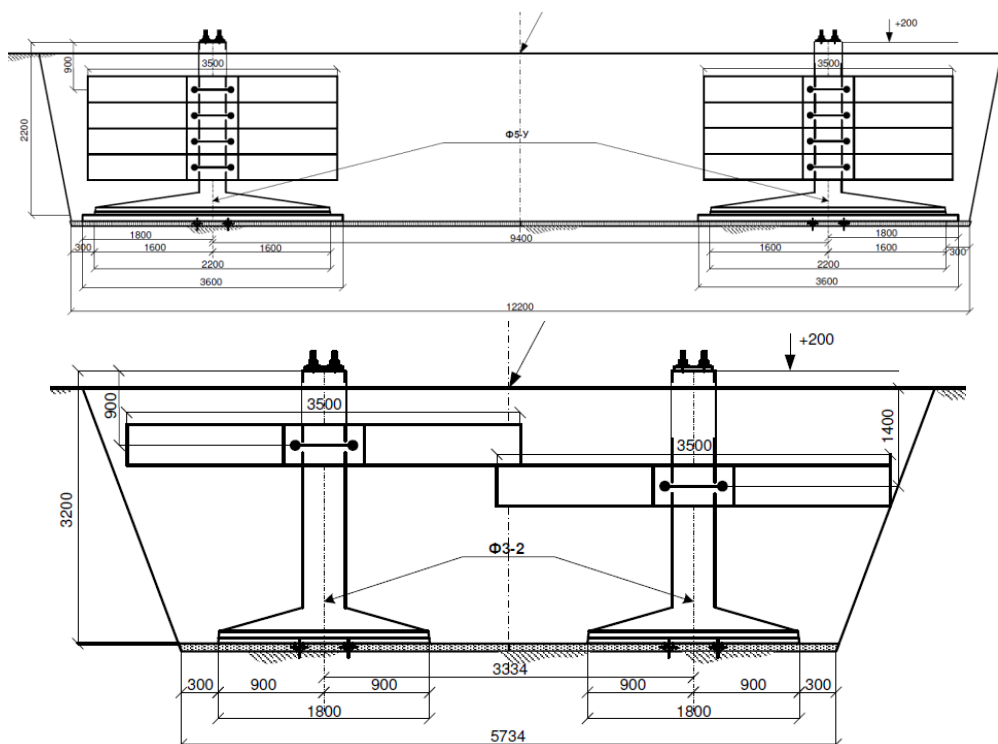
Foundations of Y220-2 Anchor pole (top) and P220-2 Intermediate poles (bottom)
